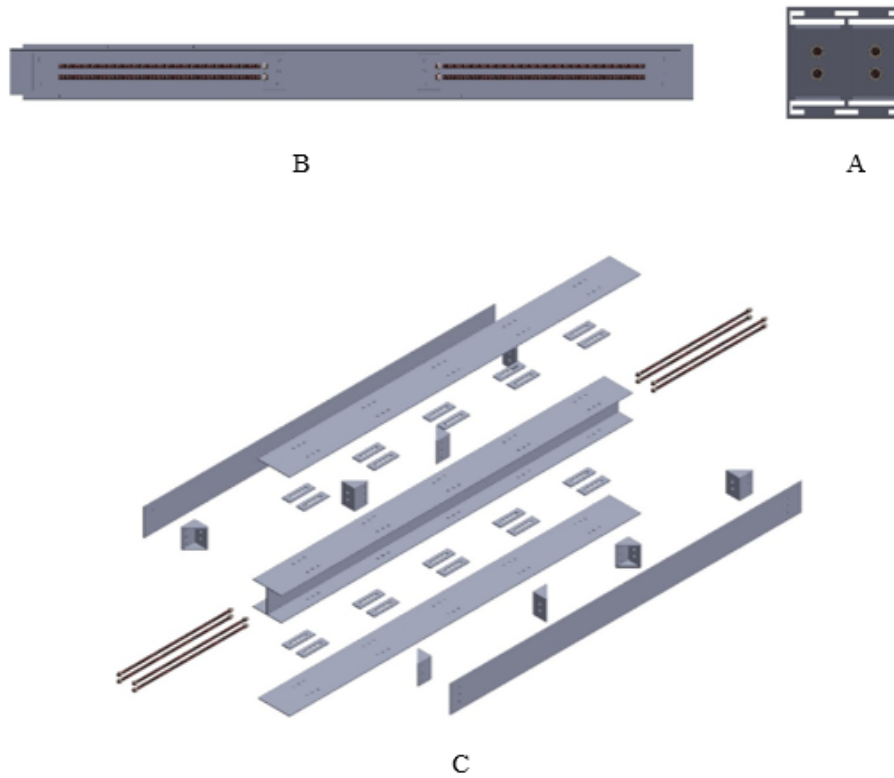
Detail of the DT-SCED. A) Bracket cross section B) Bracket sidewall C) Components required in bracket construction.
